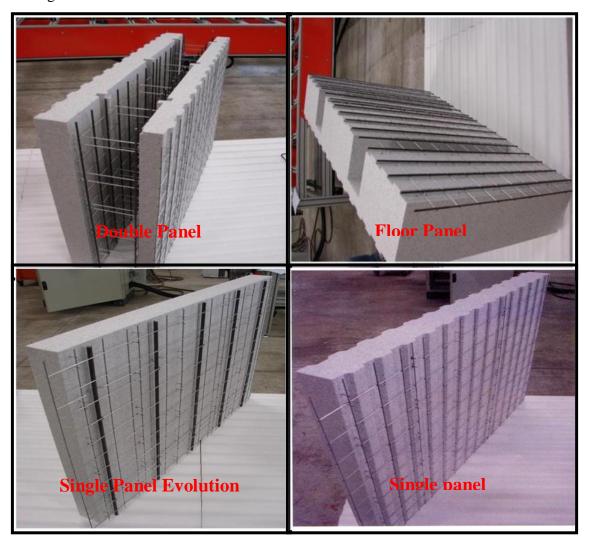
various types of EPS panels like to be used in the construction of the proposed project.
